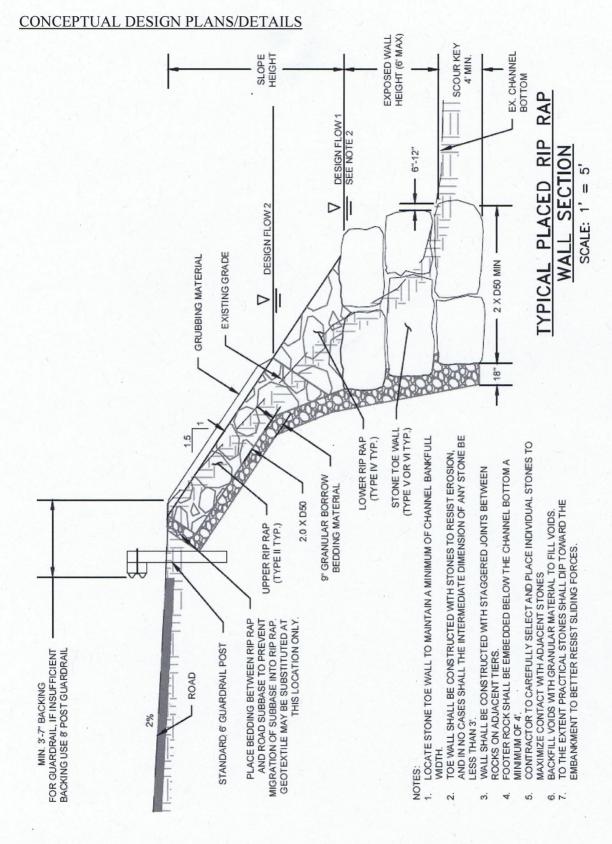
Placed riprap wall typical detail. (Source: Dubois & King and Milone & MacBroom, Inc., 5/1/2014)
